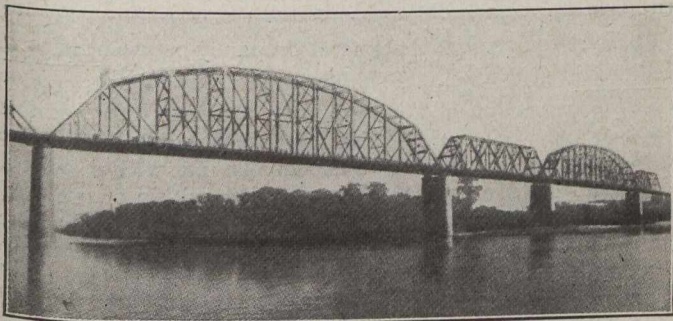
620-ft. Span Pin-connected Trusses. Typical of 1915 Construction.
